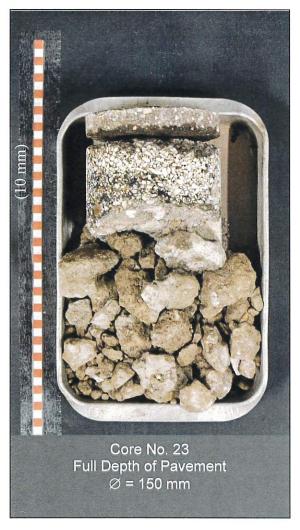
Specimen from Cherwell Road, Northbound Lane
